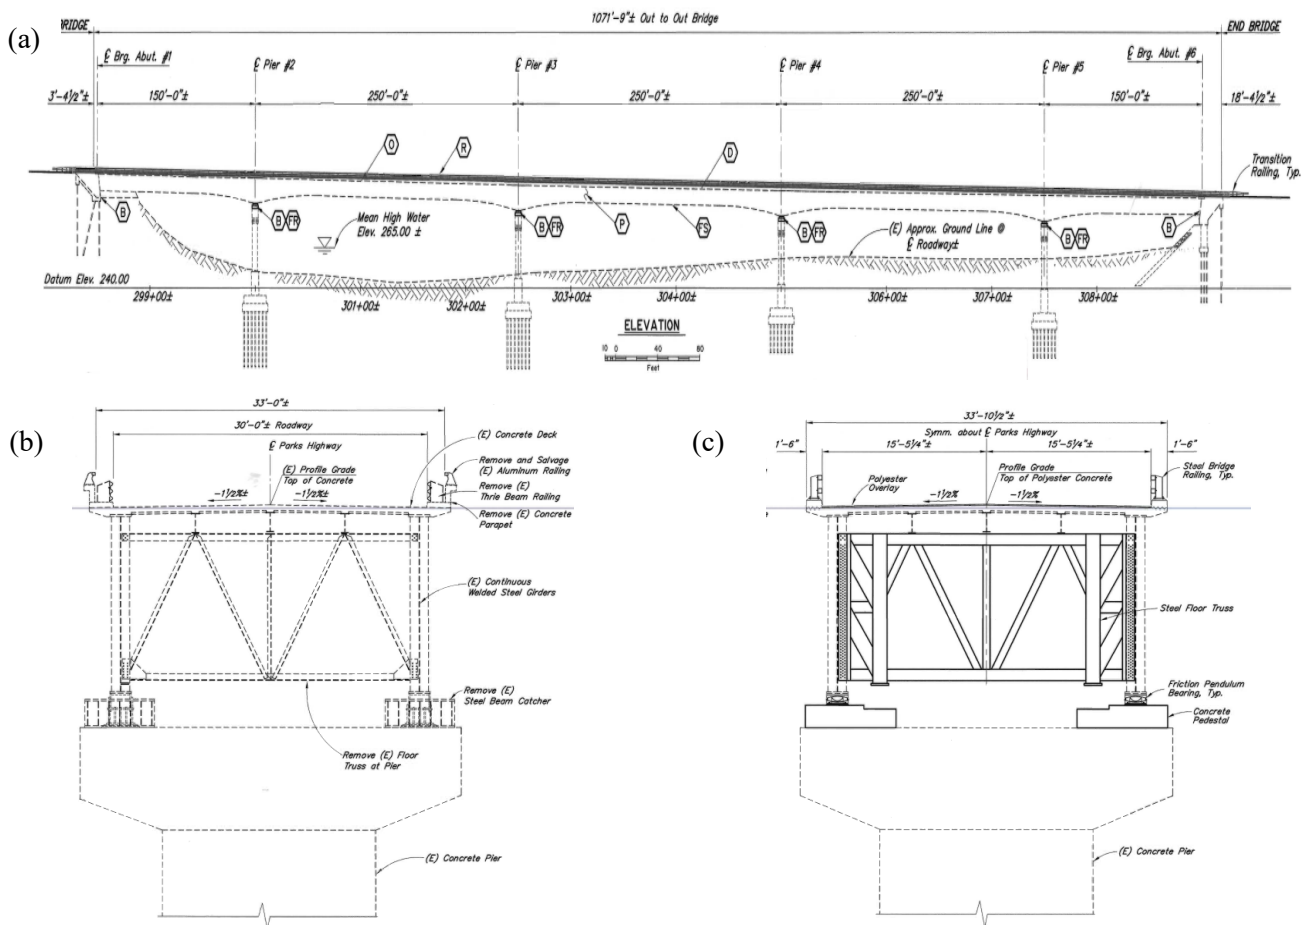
Susitna River Bridge structural system (a) Longitudinal view (b) Typical pier section before retrofit (c) Typical section after retrofit (Alaska DOT&PF, 2021).
